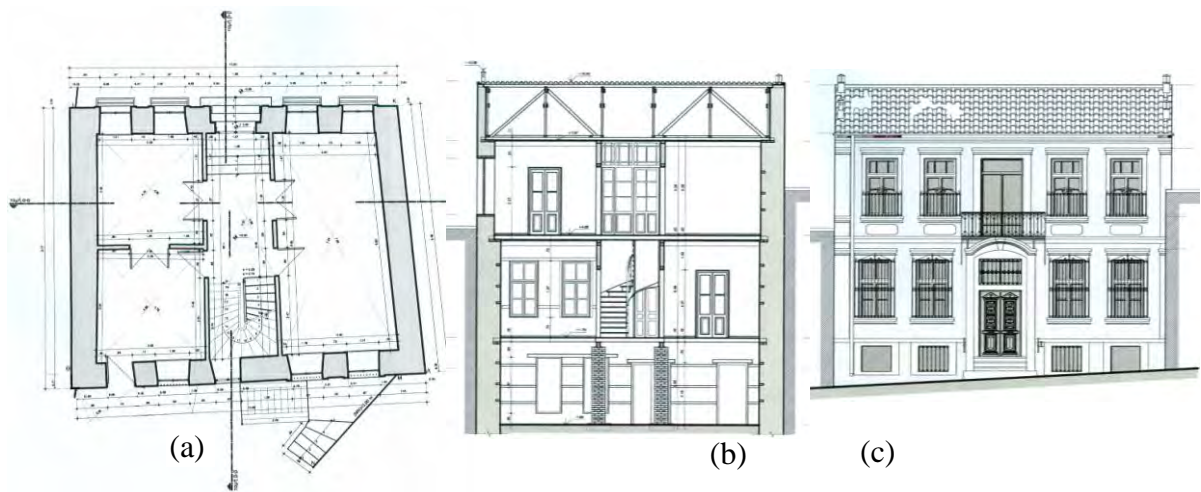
Building B: (a) Plan view, (b) Cross Section, (c) View
